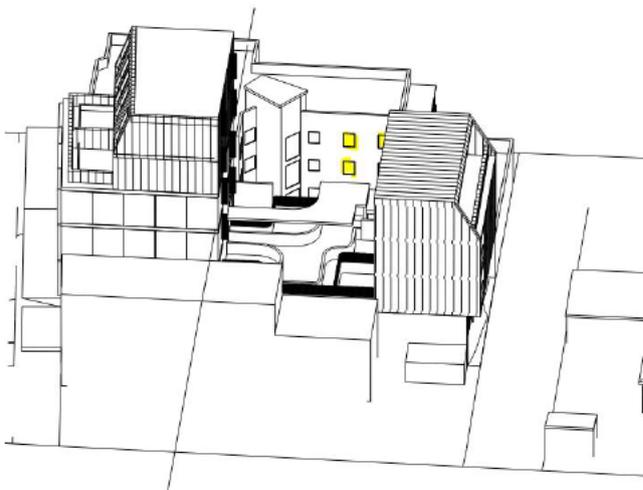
Proposed 1pm view from sun diagram – NB: north-facing living room windows highlighted yellow (Source: Arkhaus)
